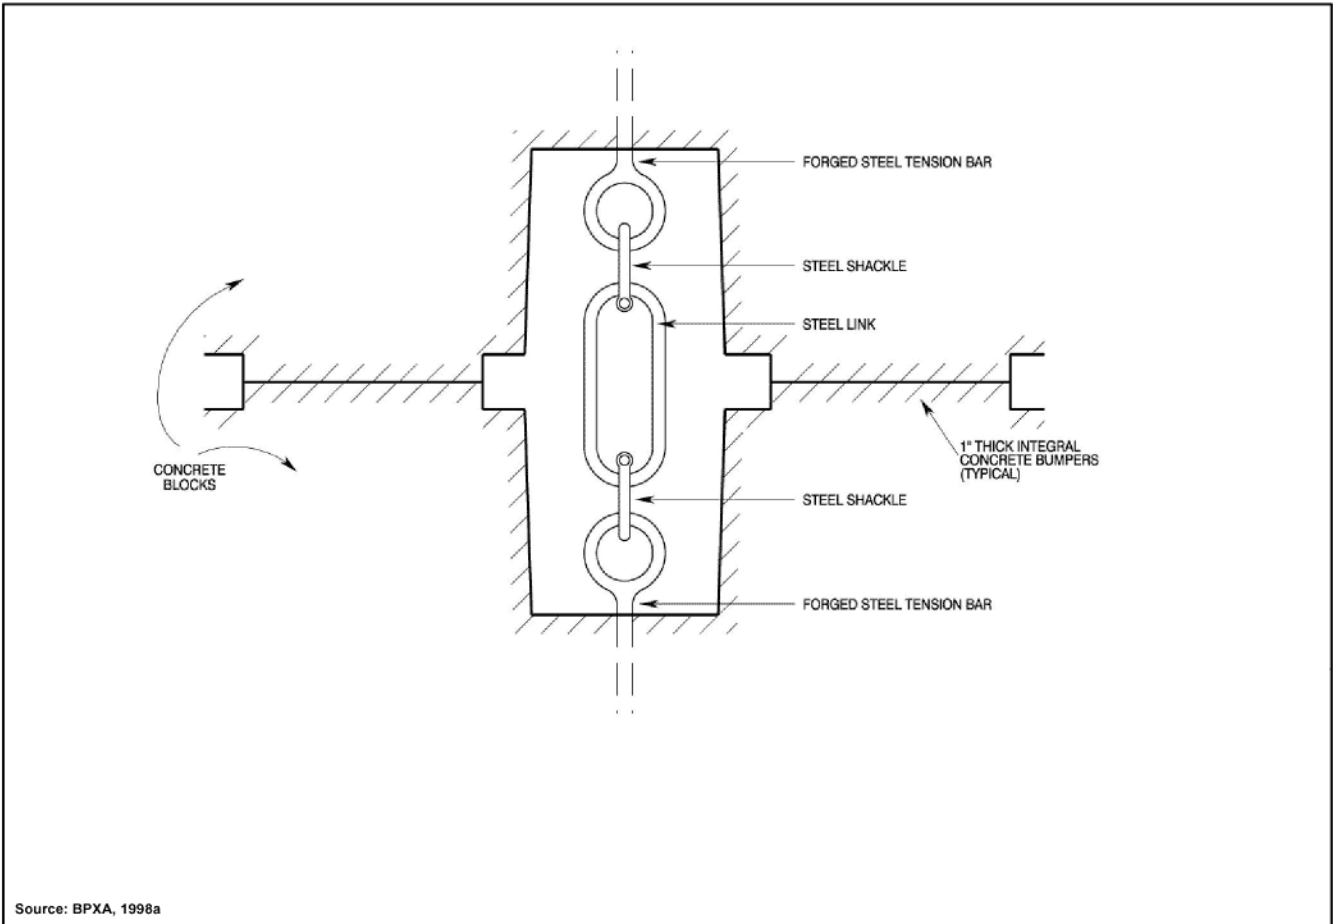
Liberty Development Project: Island Slope Protection, Concrete Mat Linkage Detail
